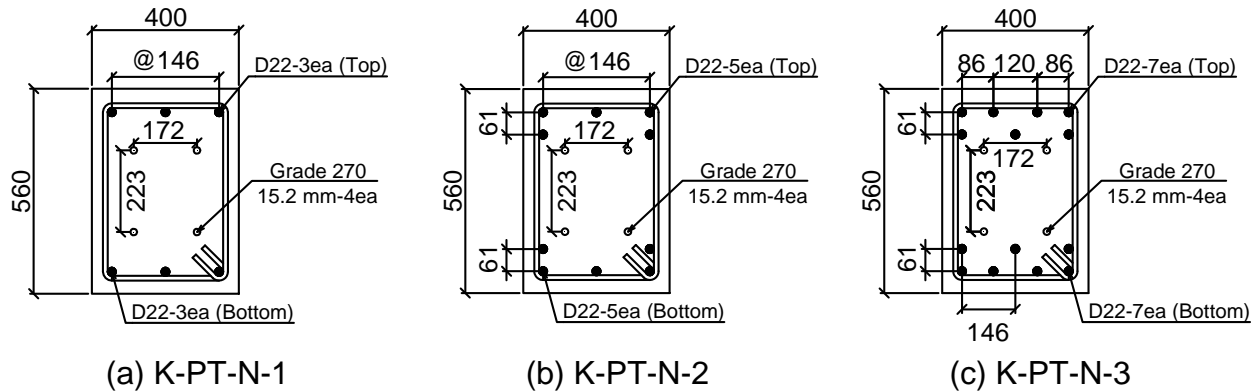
Beam sections of 'K-PT-N-1', 'K-PT-N-2', and 'K-PT-N-3'
